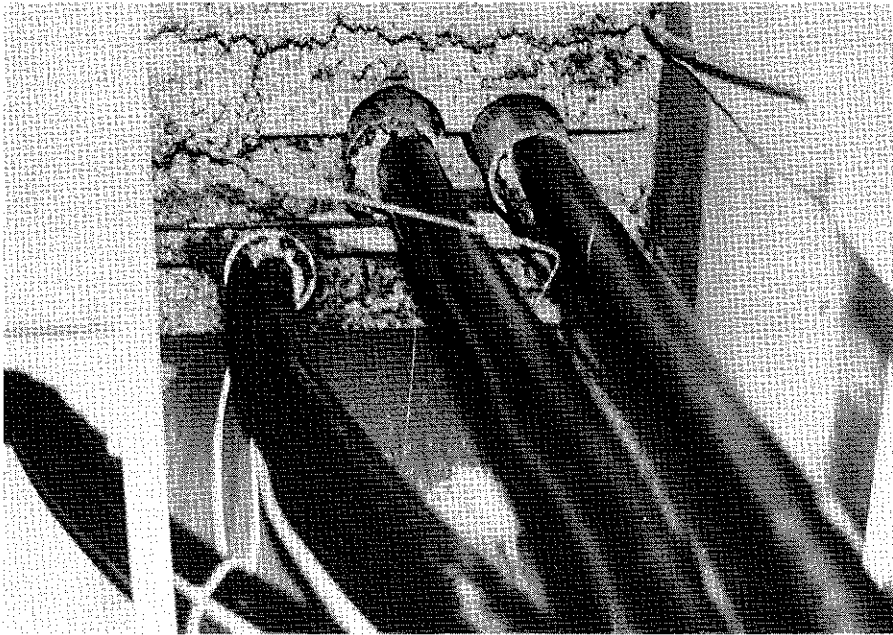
(Left) Firestopped electrical cable penetrations through floor slab.
